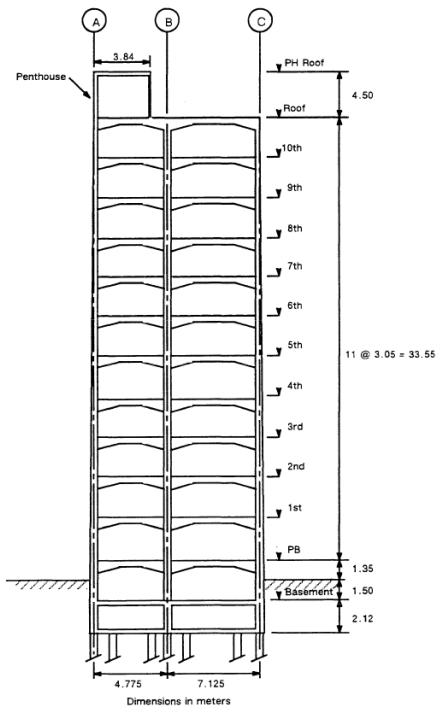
Elevation of Frame 2, 3 and 4 of the building (Downs, et al., 1991)
